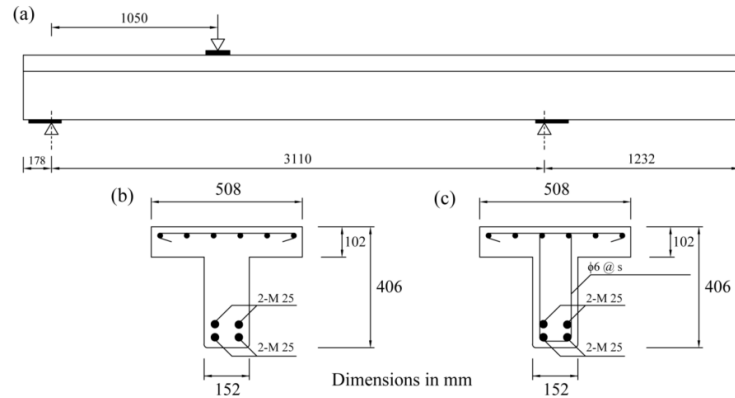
Short beam shear test (Barros et al. 2008)
